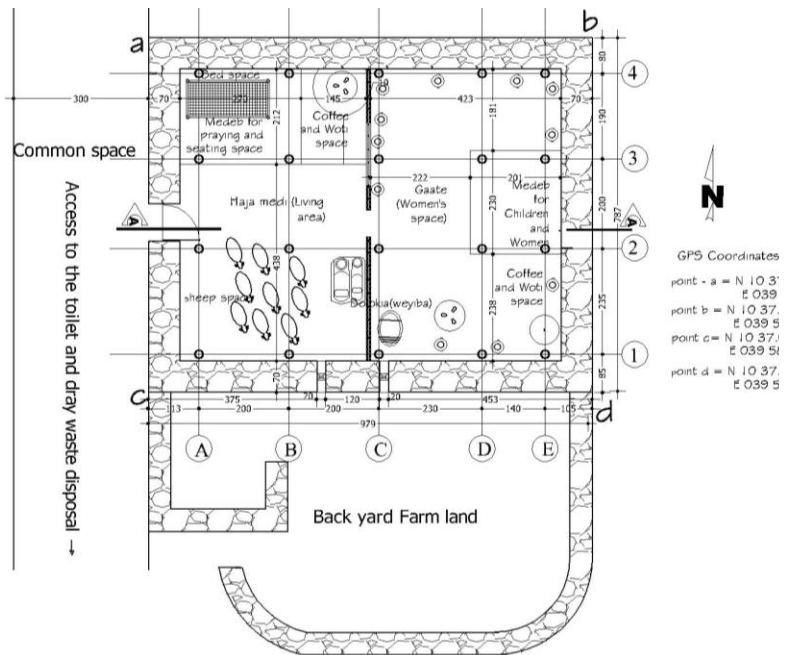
163 compound and floor plan of W/ro Merema Osuman’s house.
